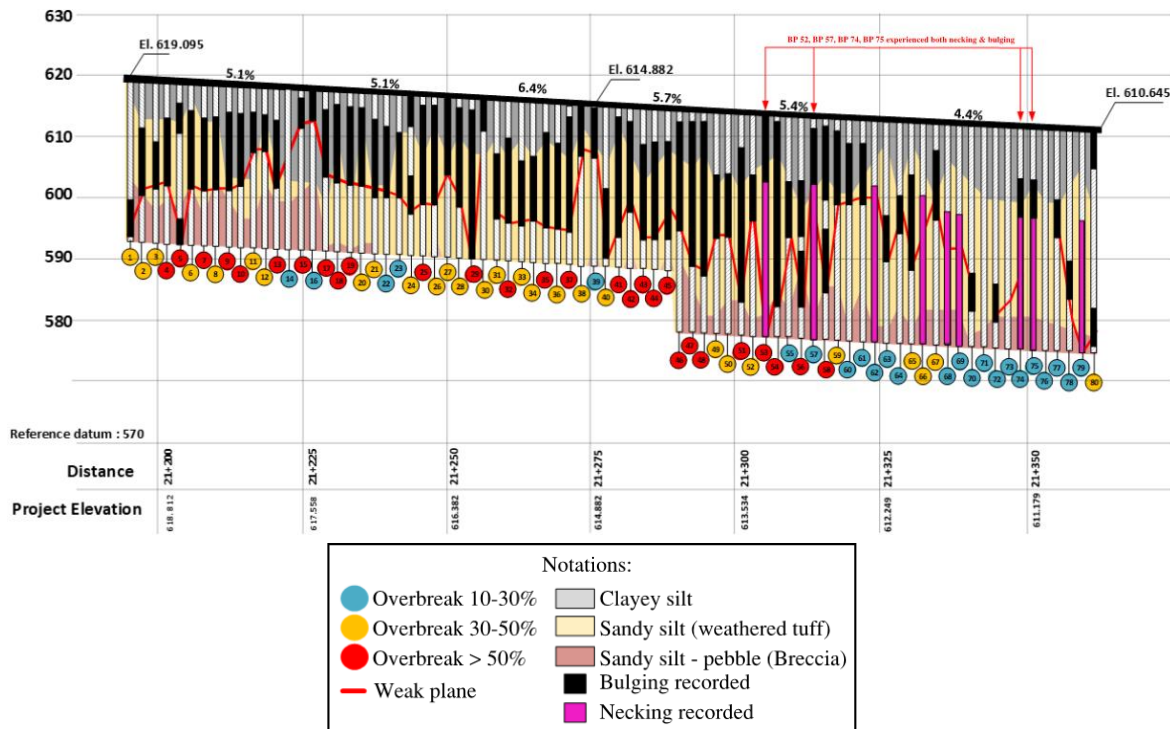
Soil Profile and Pile Condition Base on drilling record STA 21+200
